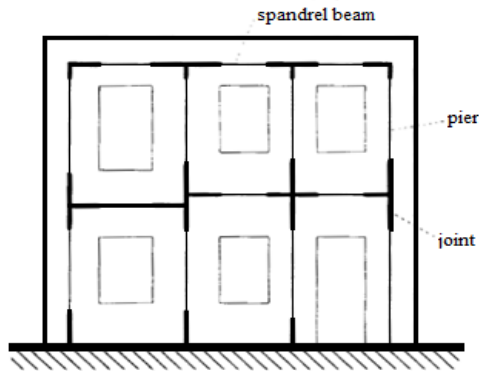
Equivalent frame idealization of a multistory wall with an opening, Magenes (1998)
